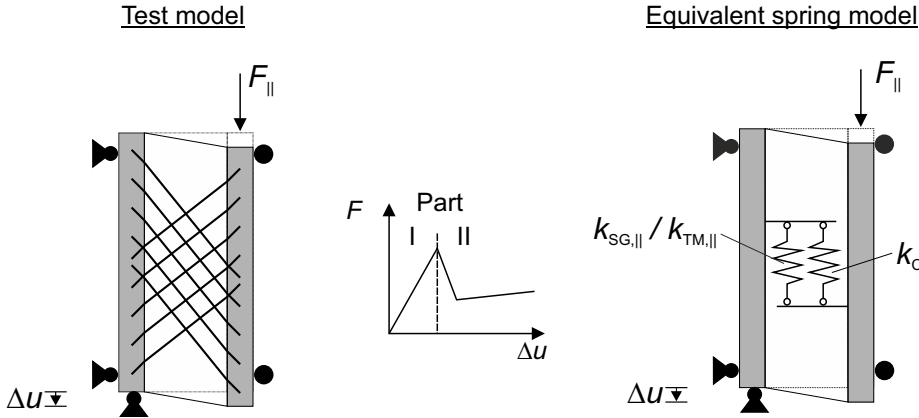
Spring models for shear loading of sandwich sections (reproduced from /Hor10/ and /Sha15b/)
